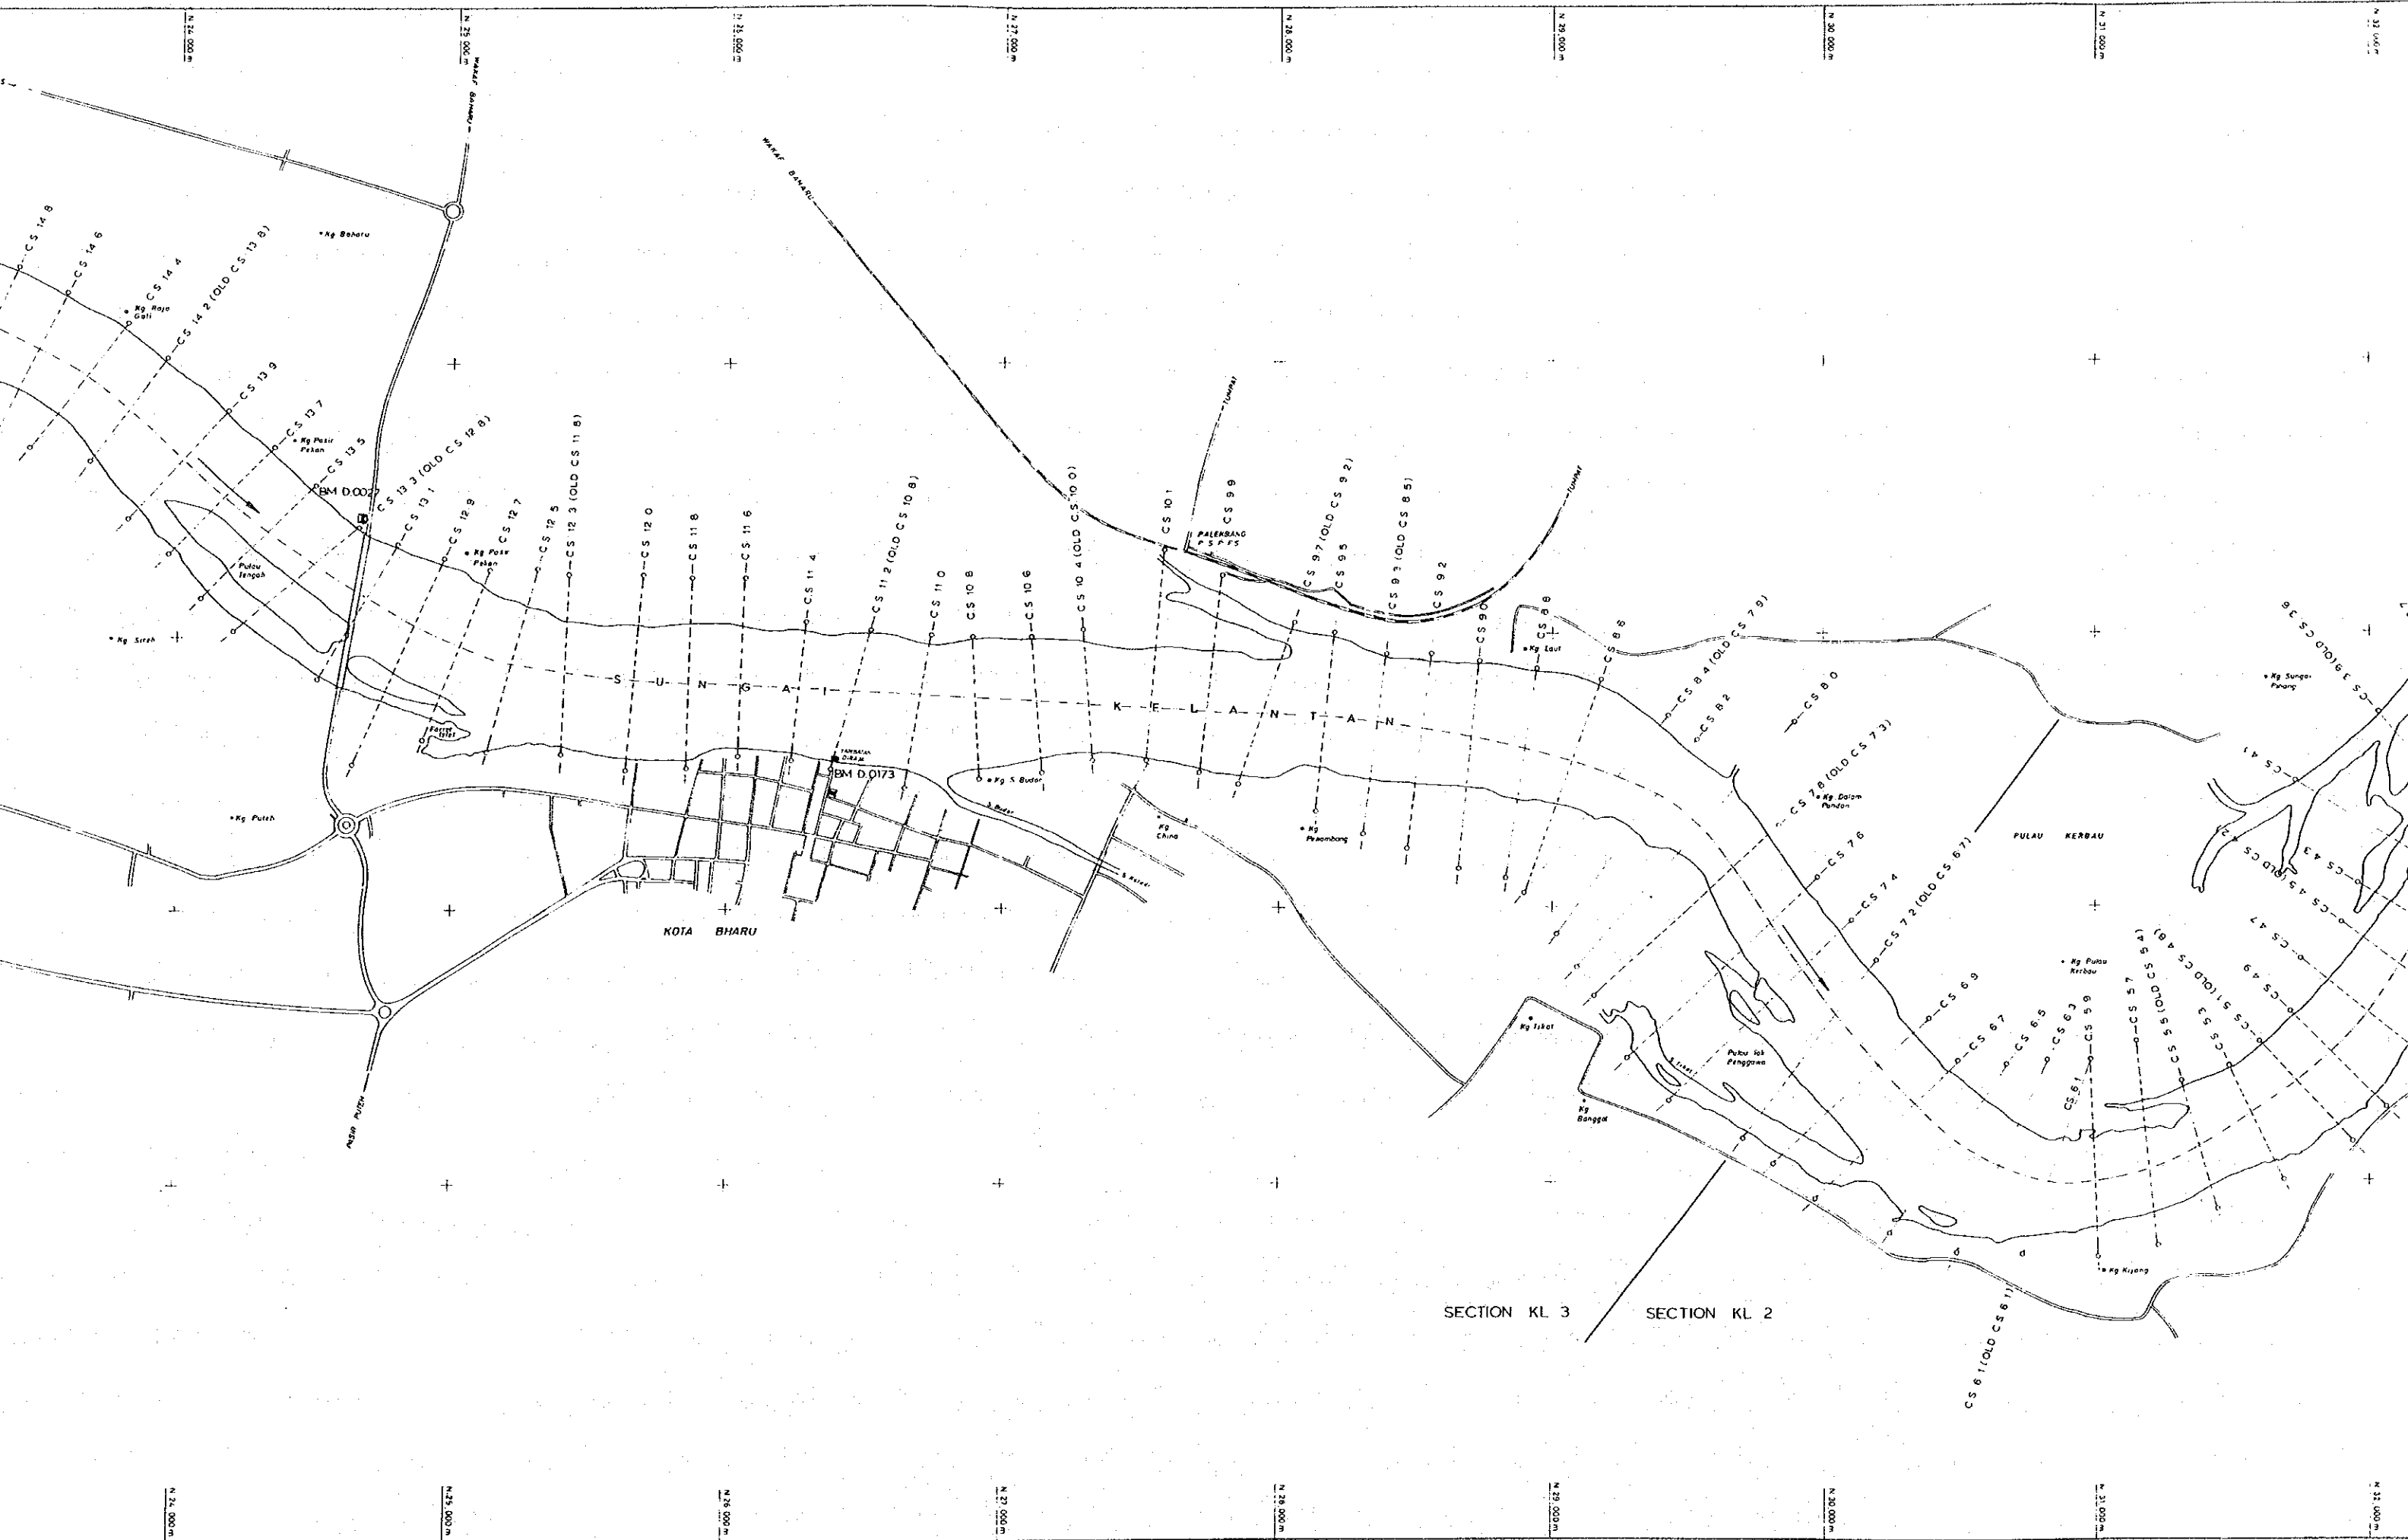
DETAILS & LOCALITY PLAN OF CROSS-SECTIONS
